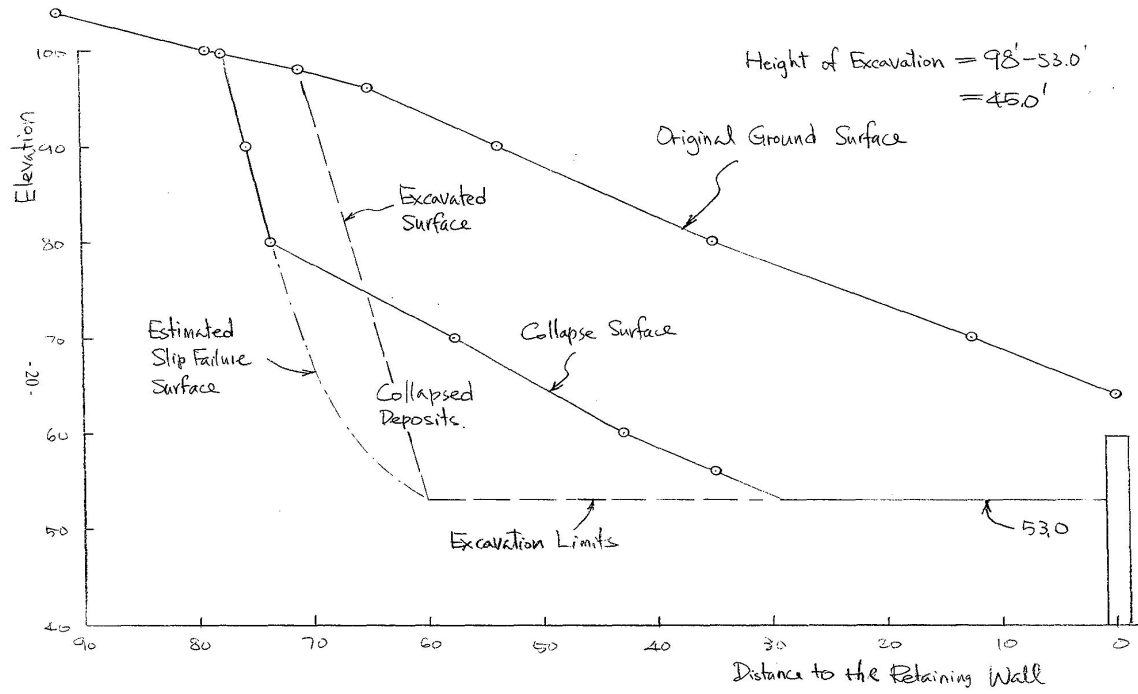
Cross Section of the Original Ground Surface, the Excavated Surface and the Failure Surface in the Collapse Area (90 feet from the turning Point of the Retaining Wall).
